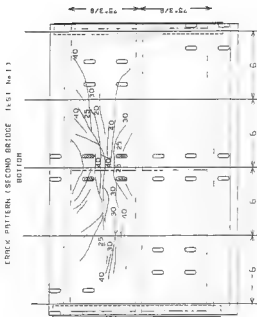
Bottom Cracking Pattern (Second Bridge - Test No 1)
